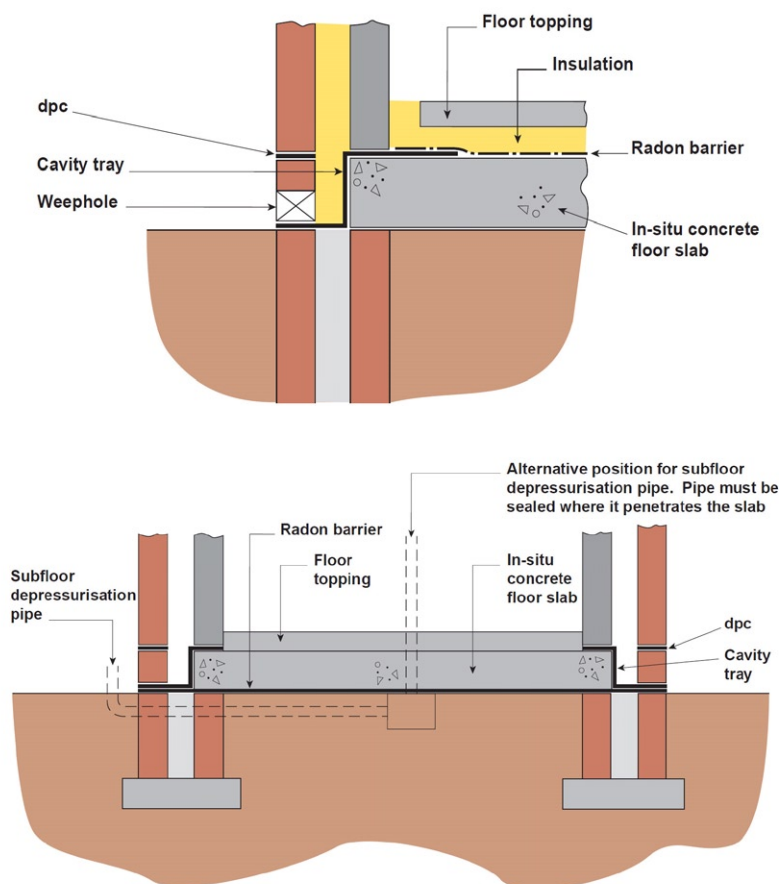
BRE guidance for radon barrier and sub-floor depressurization in the case of a in-situ concrete ground floor (BRE 2007).
